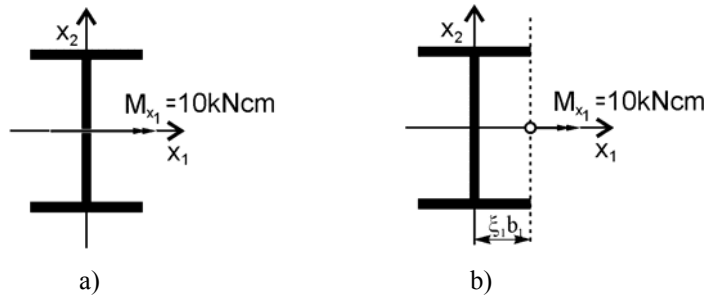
I-section: a) Loading case 1, b) Loading case 2
